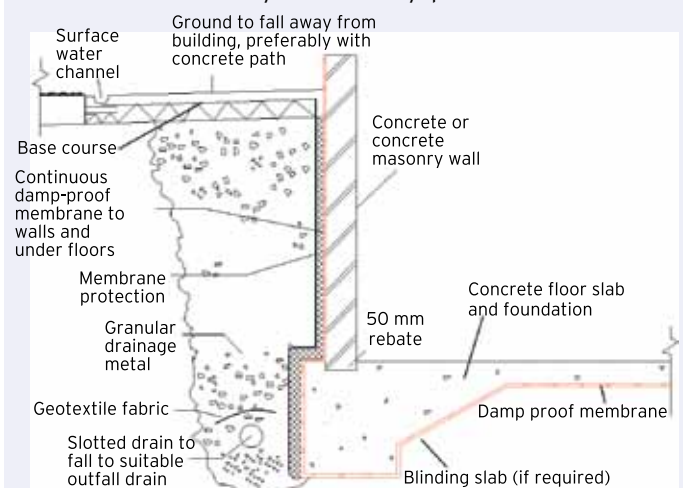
Cross sectional details showing typical waterproofing by membrane and perforated pipe arrangement to lower ground water table to relieve raft of hydrostatic pressure head
